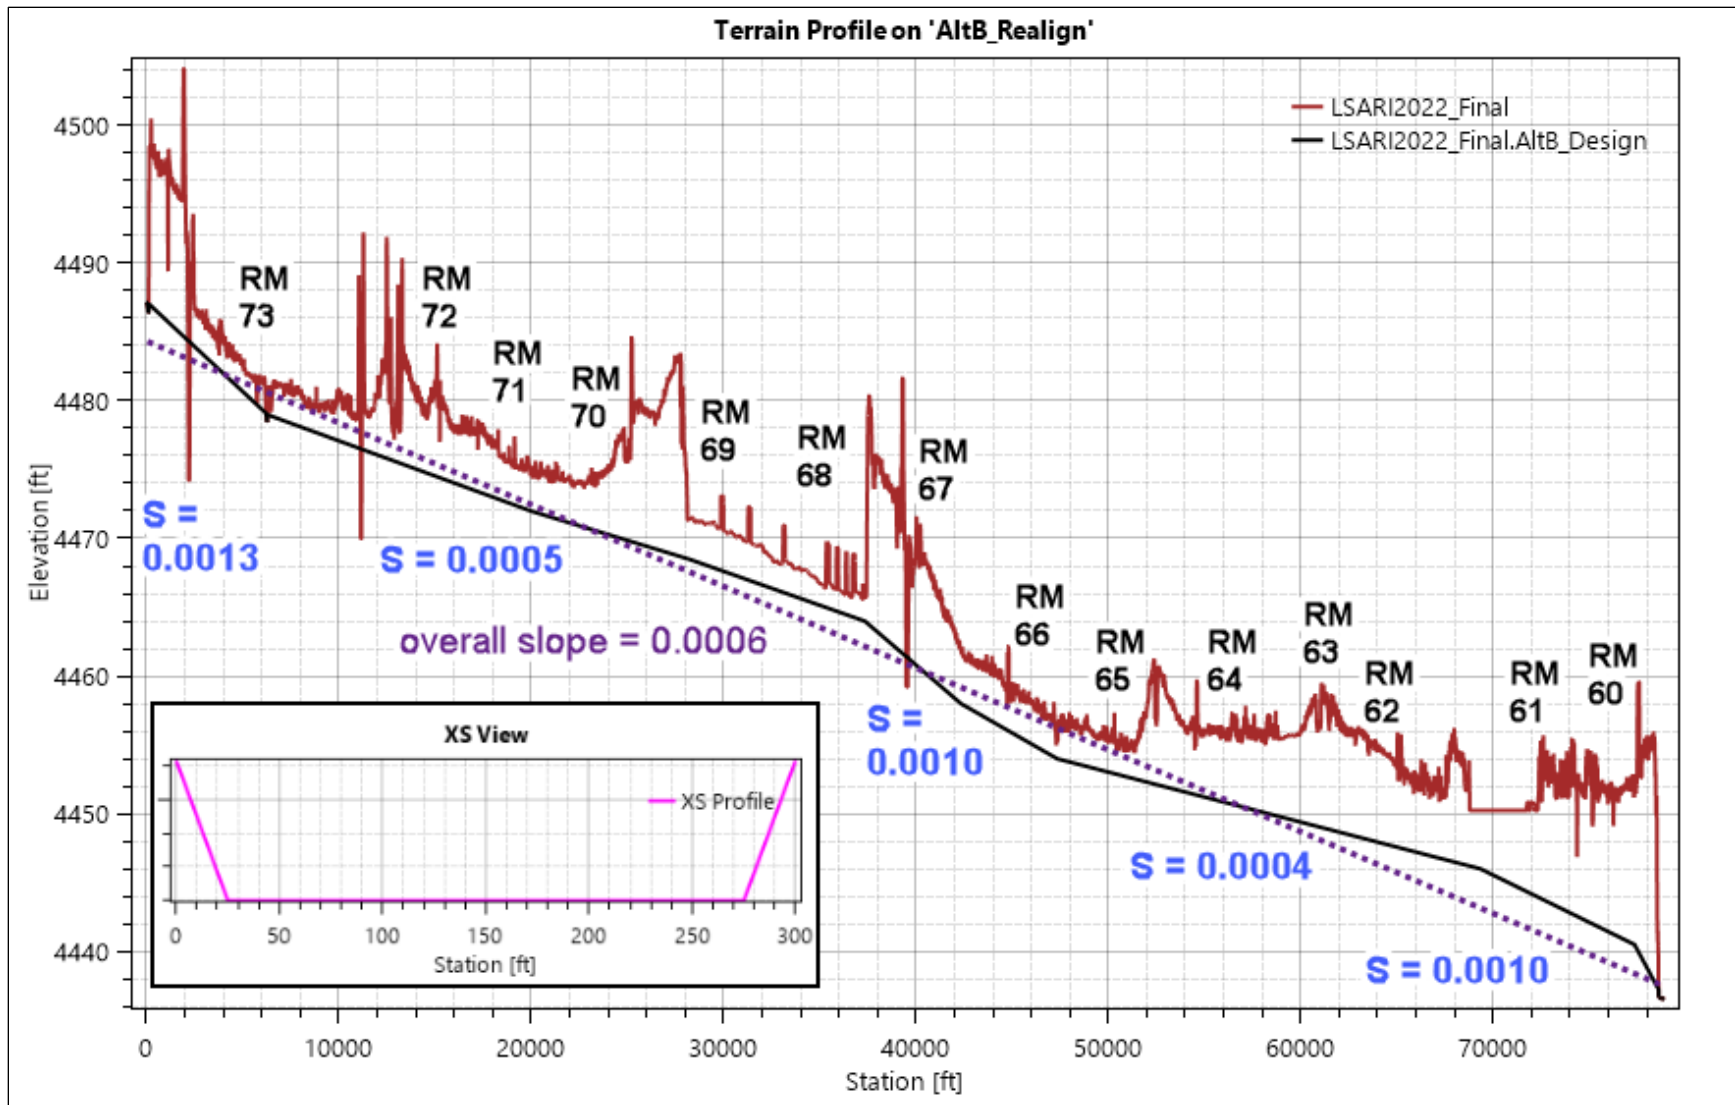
Alternative B design elevations. Inset graph (lower left) shows typical cross section with 3:1 side slope, 250 ft bottom width, and maximum 300 ft top width. Main graph shows longitudinal profile where brown line represents existing ground, dark blue line represents constructed profile, and purple dashed line represents best-fit profile along constructed alignment.
